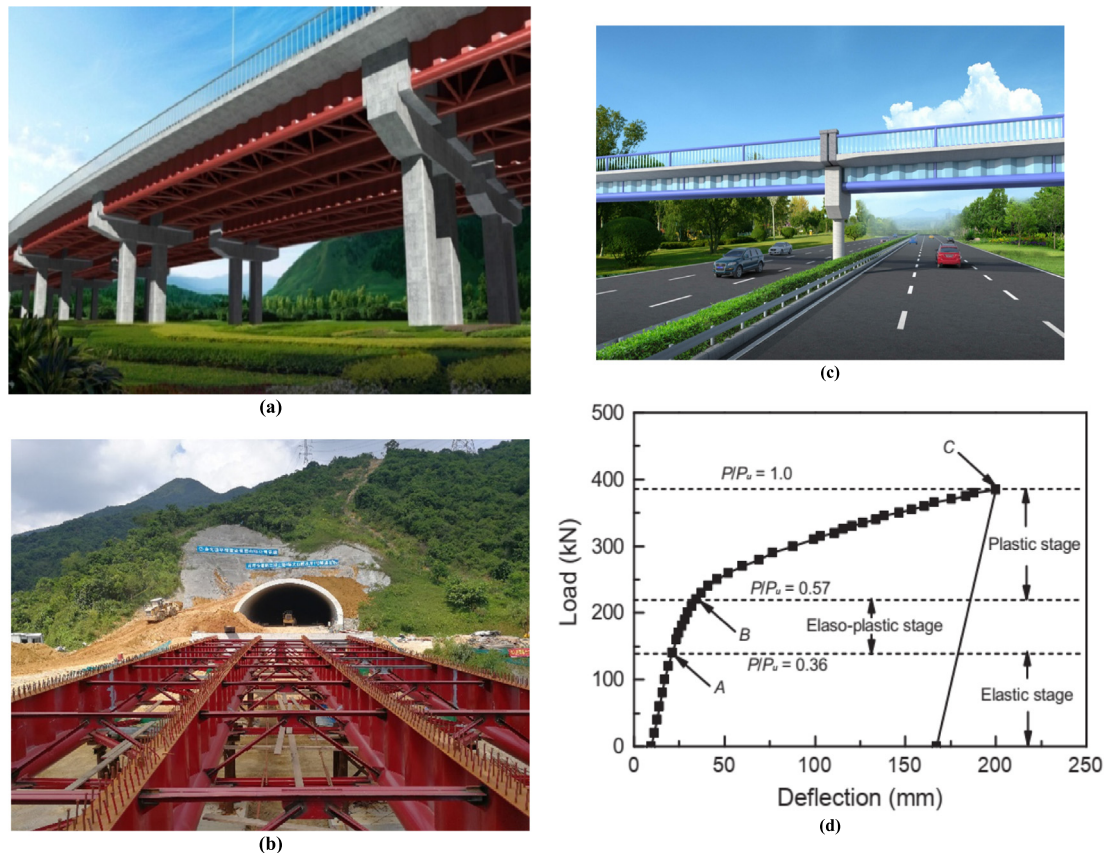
(a)- Maluanshan Park Viaduct: architectural rendering (b)- Maluanshan Park Viaduct: construction site (c)- A footbridge at Hebei Province, China. (d)- Loading/Deflection diagram measured at mid-span of the test beam [34].
